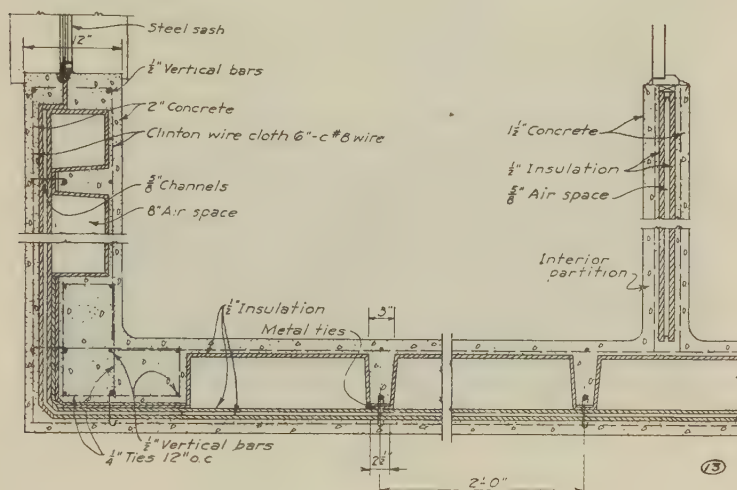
TYPICAL WALL PLAN OF INSULATED CONSTRUCTION
